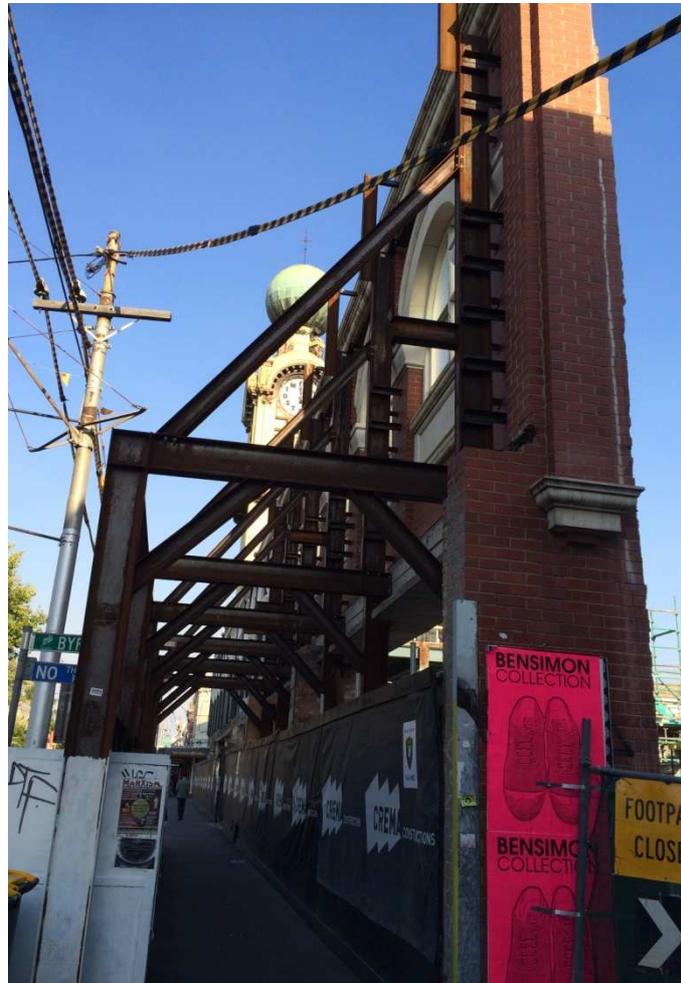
External gantry façade (with walk way under) support at the old Dimmeys store in Richmond
